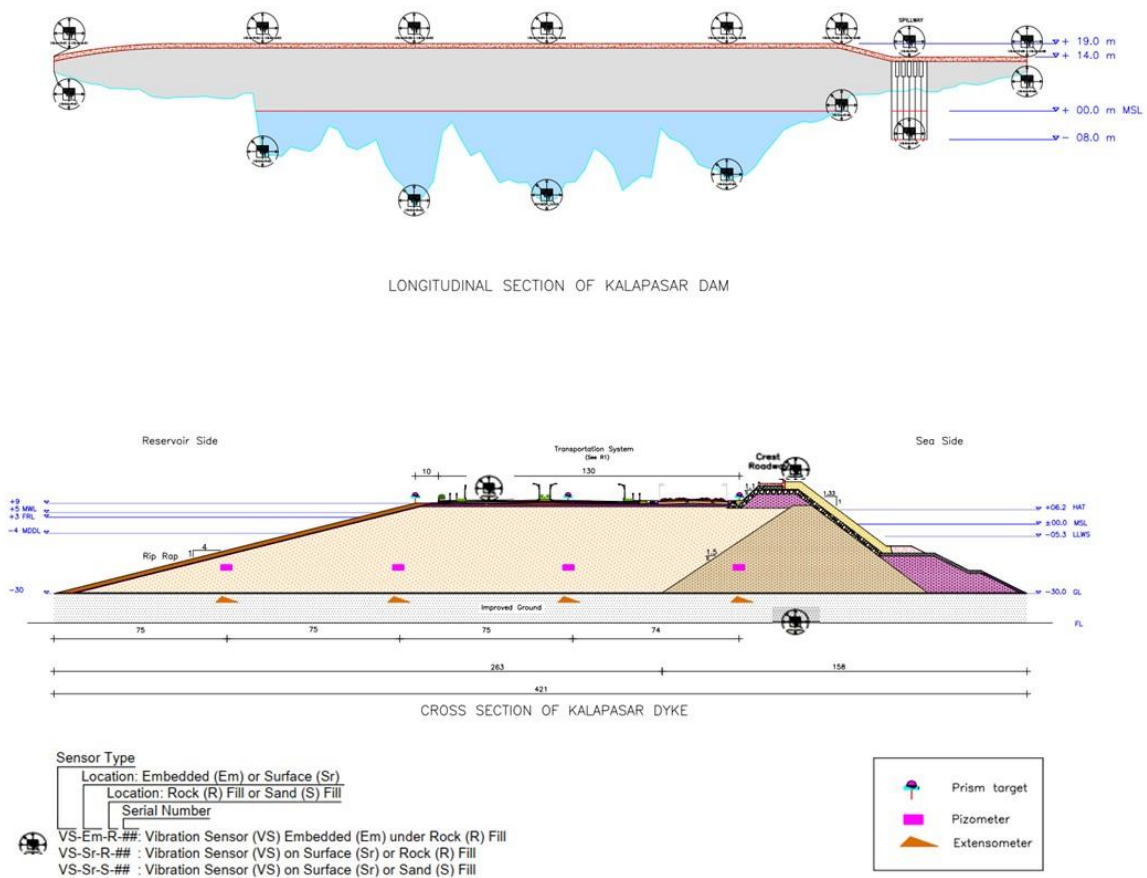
Proposed Locations of Seismic Vibration Sensor to be Installed
